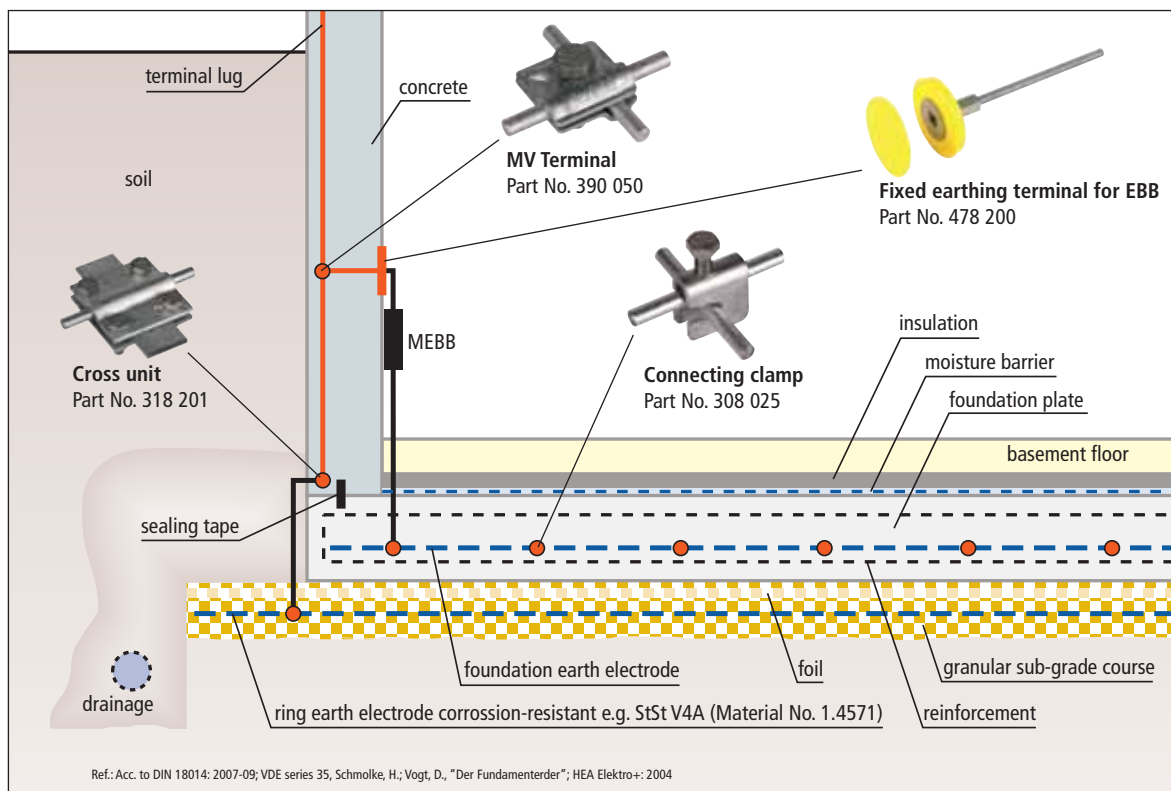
Arrangement of the foundation earth electrode in case of a closed tank "white tank"
